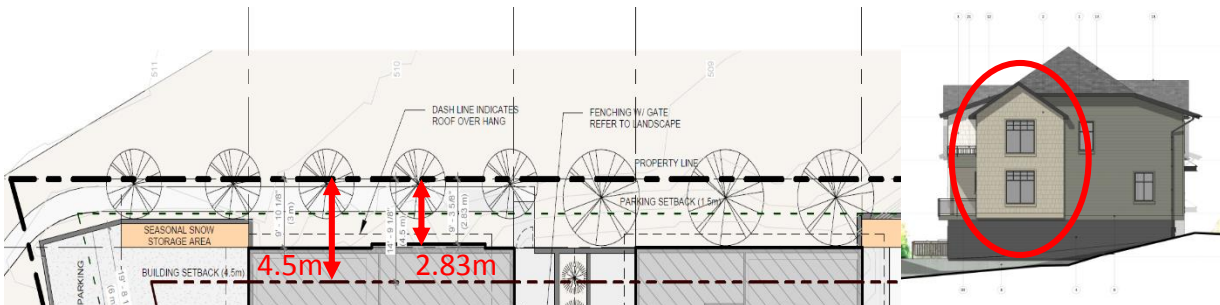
Left: reduced interior side setback to 2.83m (3m building setback with 0.17m for a pop-out). Right: proposed 0.17m pop-out.
